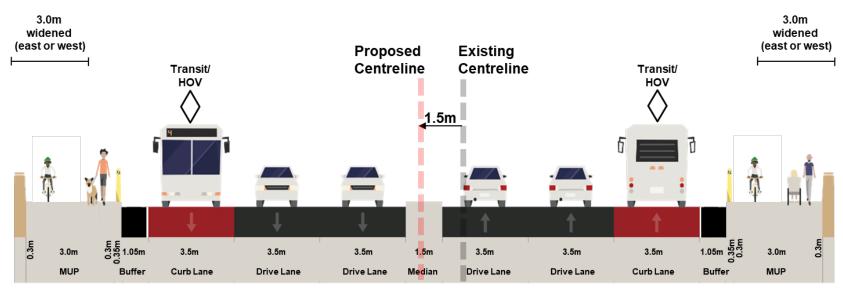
Alternative 4.1 – Structure Widened by 1 Girder, 2 MUPS (Road Shift)
